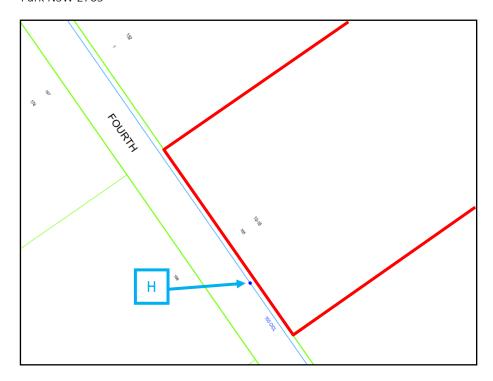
Section Sydney Water Reticulated Mains Water Supply Layout Plans
